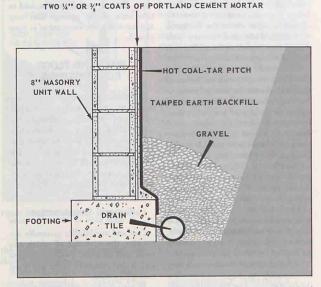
Waterproof construction of masonry unit walls. In very poorly drained soil, the gravel should extend almost to the top of the excavation.
